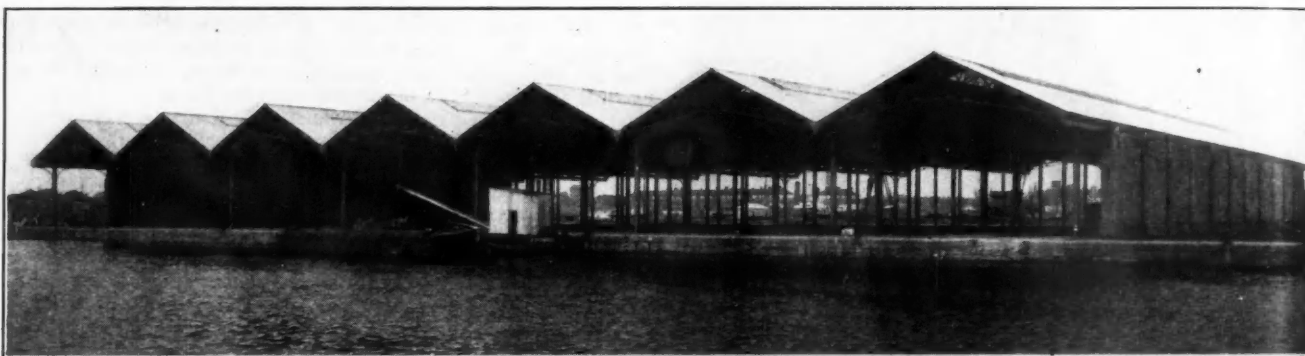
Typical timber storage shed, Surrey Commercial Docks.
